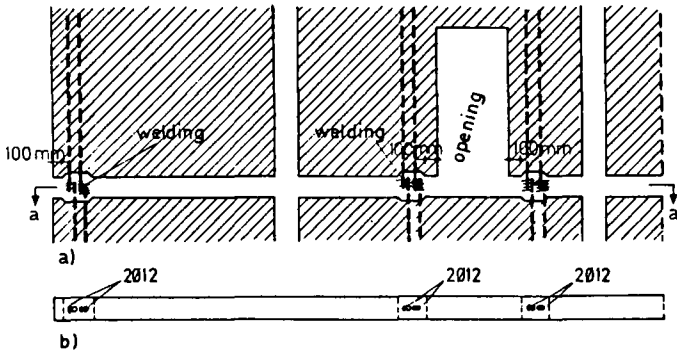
Sketch showing the minimum requirements for keys and reinforcement in the horizontal joint (Other geometrical or reinforcement details are not shown)
